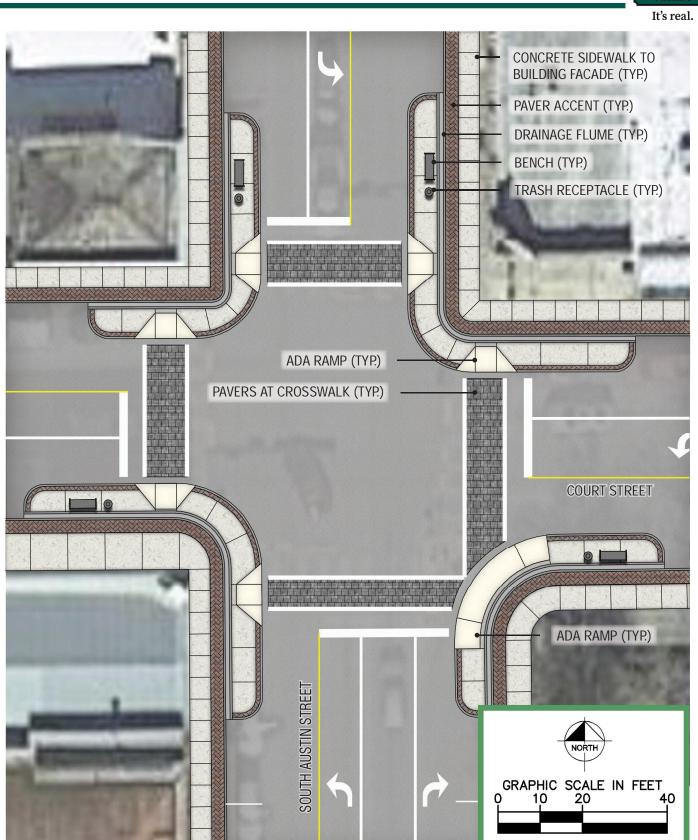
Typical Street Improvements (Intersection of Court Street & Austin Street)
